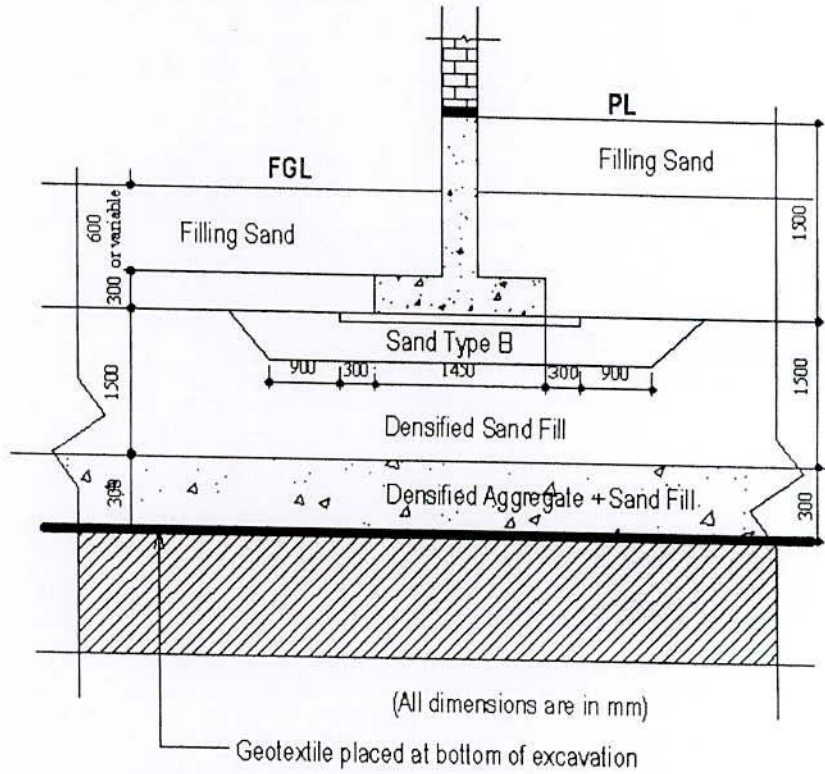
Details of wall footing on mattress (after Kabir et al., 1997).
